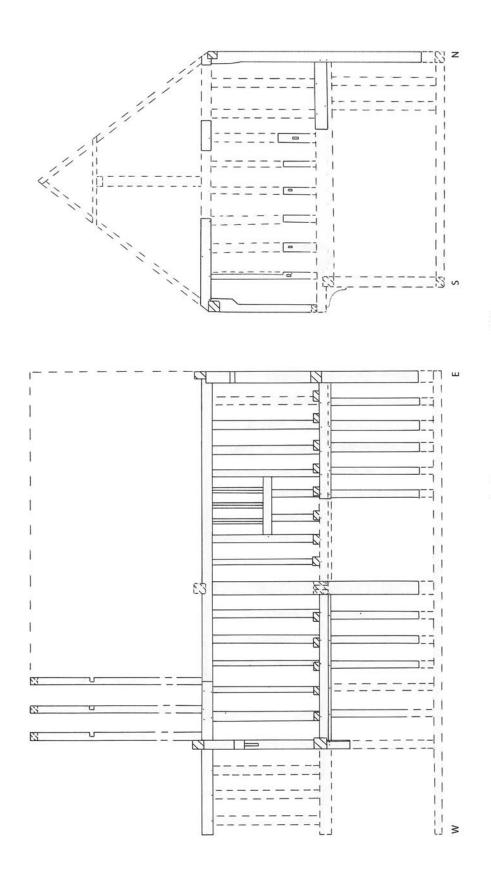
(left) East (side) and (right) north (rear) elevations of 40 Head Street (corpus no. 29). Drawn by Richard Shackle
